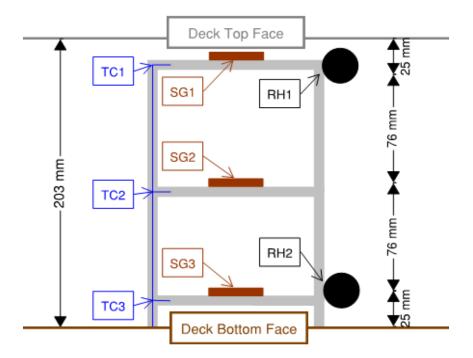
Typical Instrument Cluster Diagram at the Markham Ravine Bridge.
